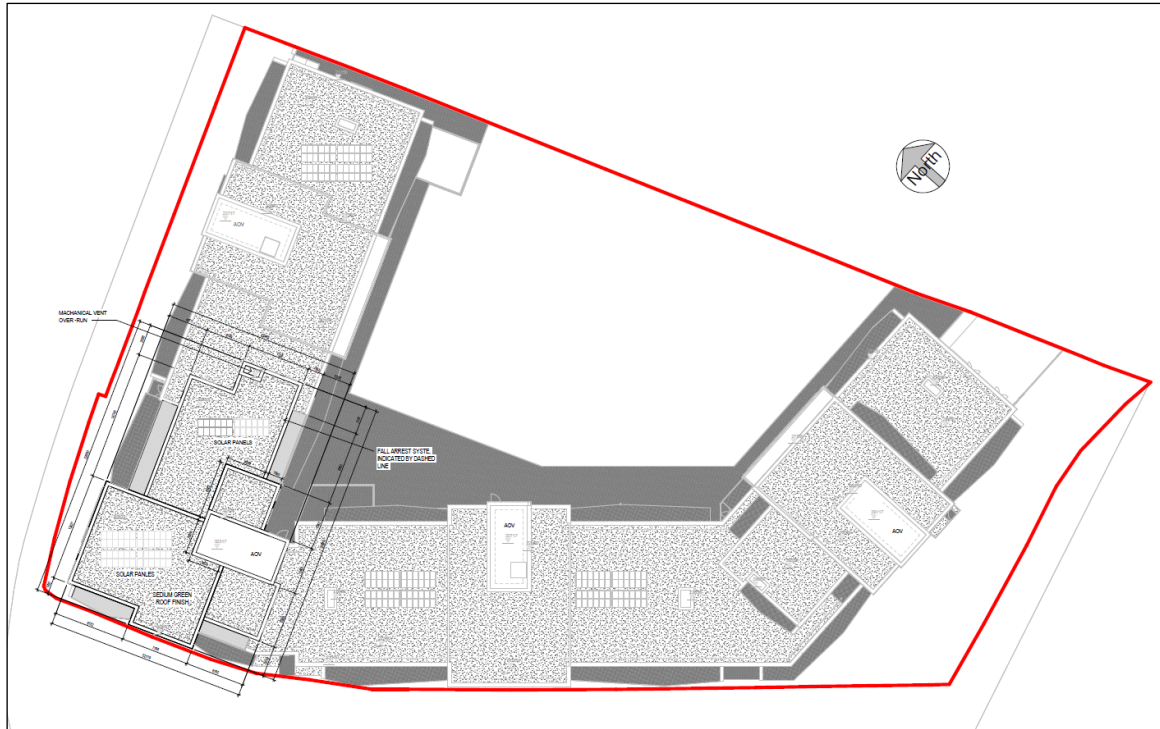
Roof plan of development approved under ABP Ref. No. 303803-19
